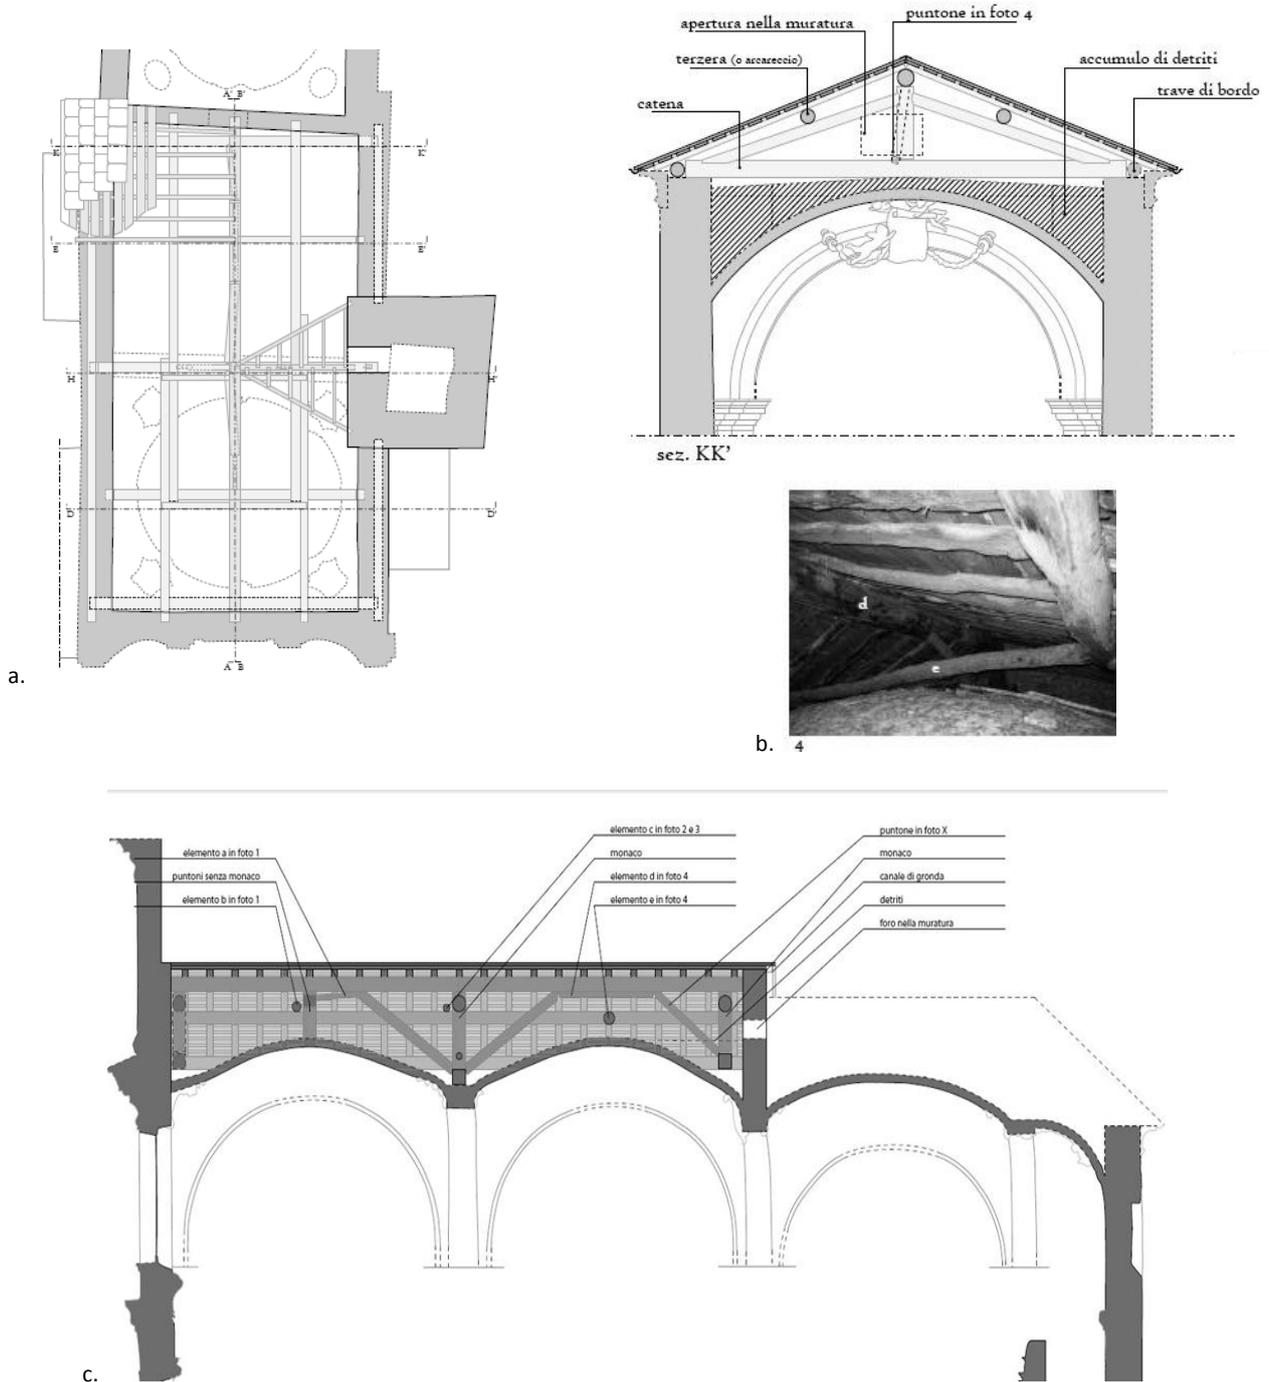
Roof analysis in floor plan with indication of the sections' positions (a), in the cross section KK' (b)
